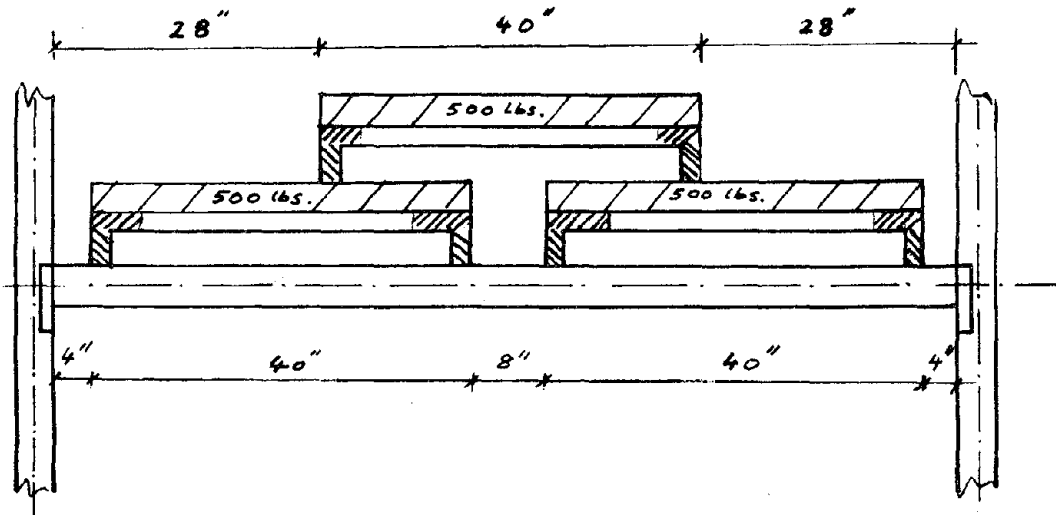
Loading Arrangement per Level per Bay per Frame -- Test A-R-1
